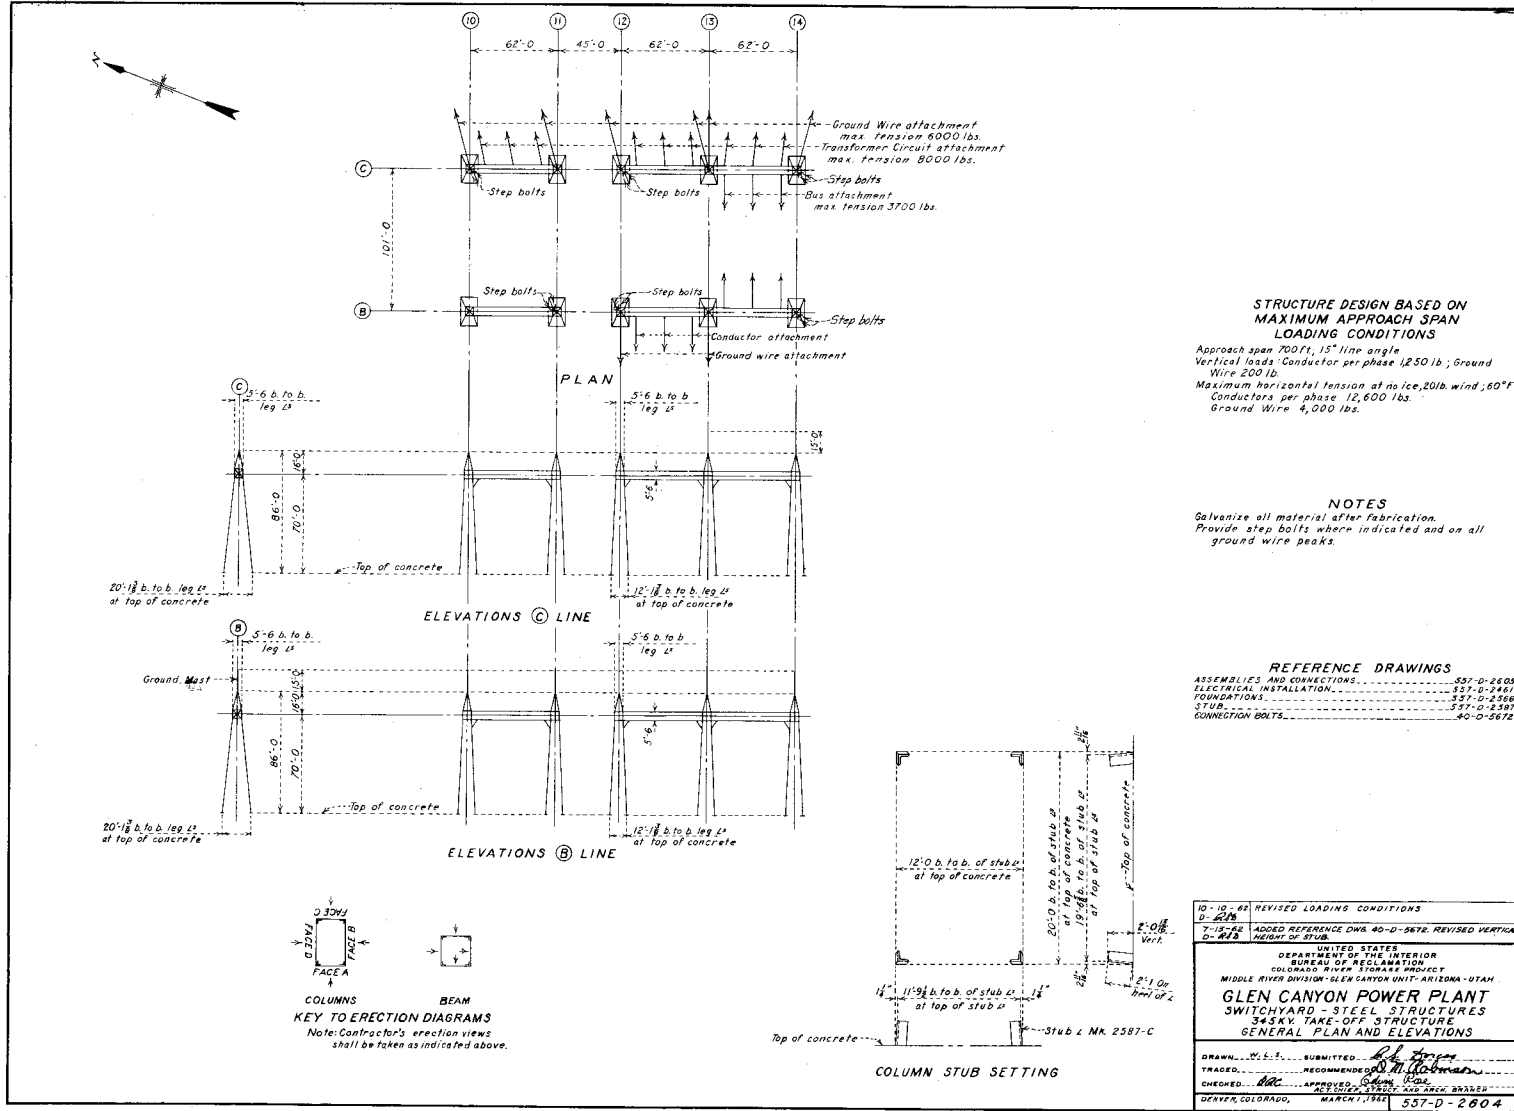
Switchyard steel structures, 345-kilovolt takeoff structure—General plan and elevations.
